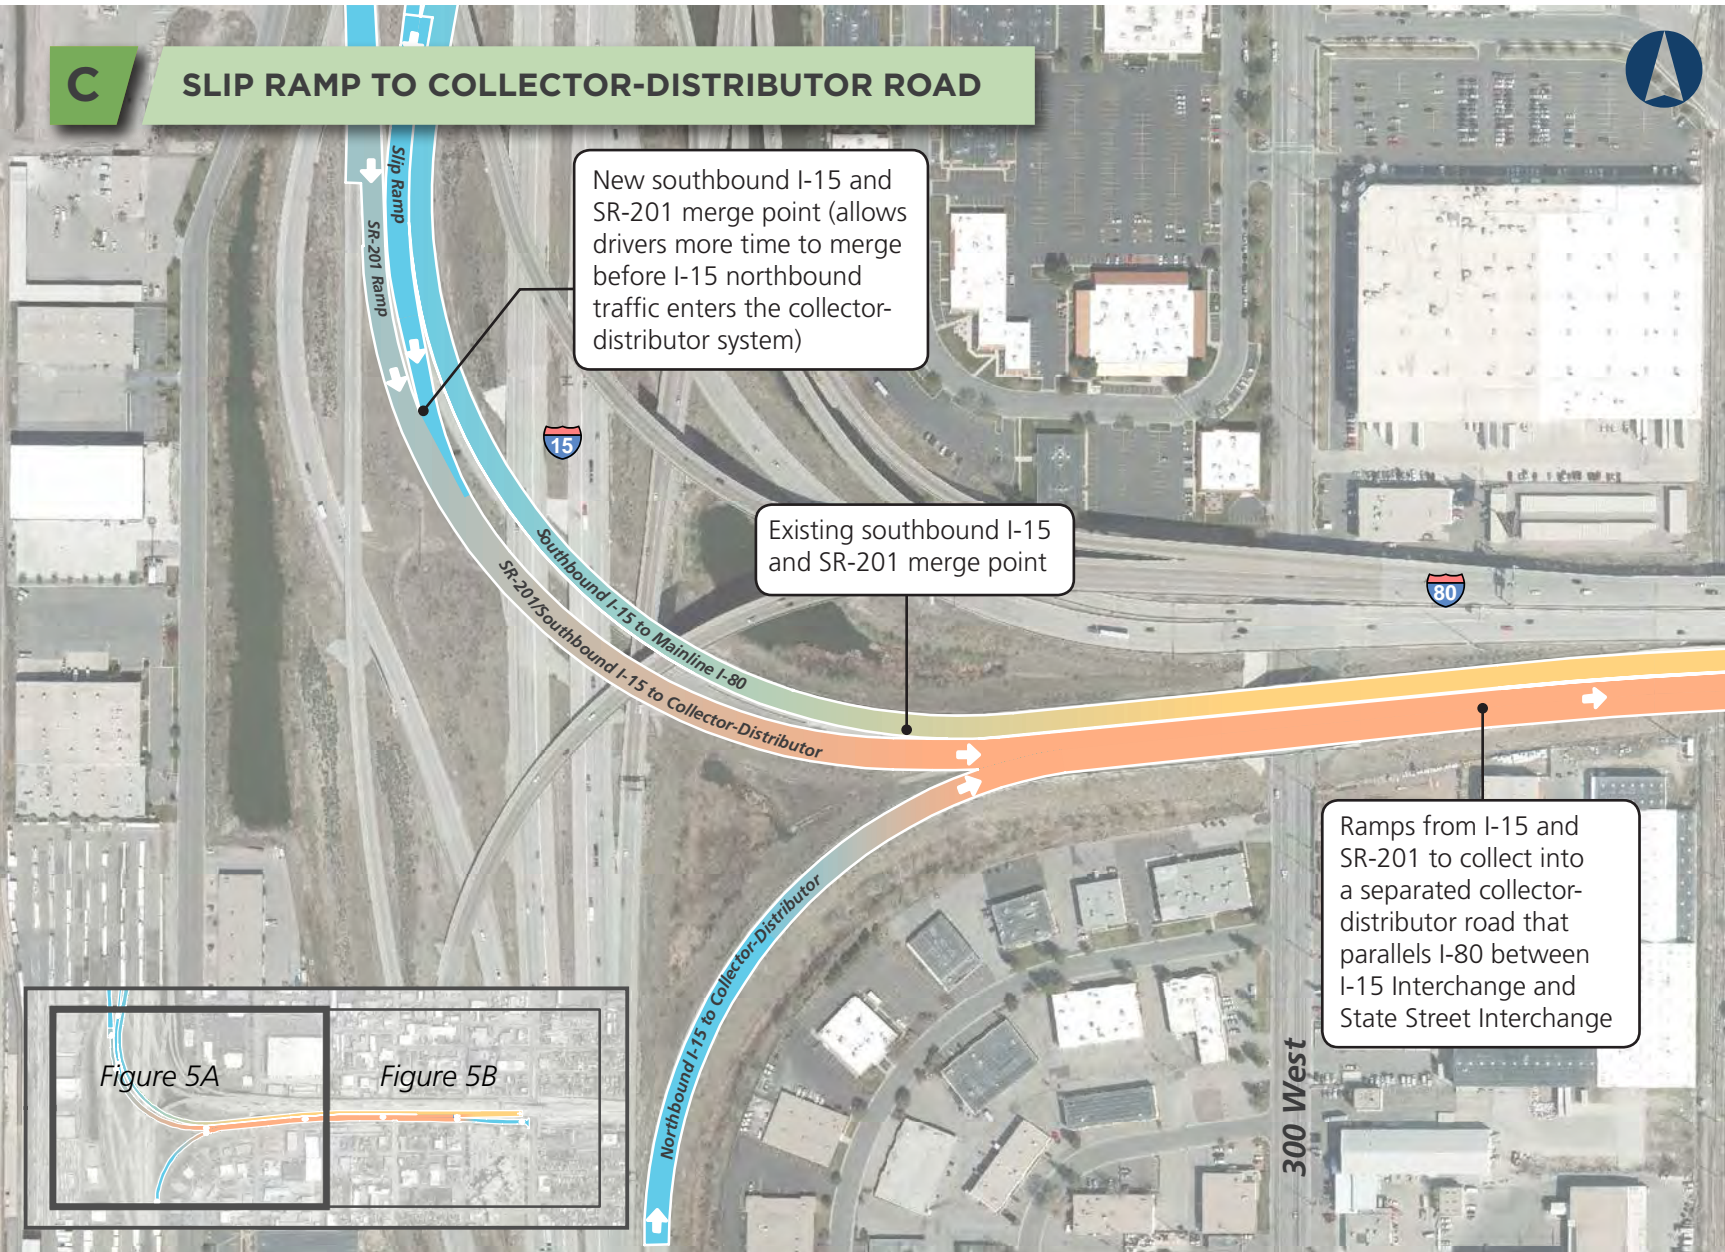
A Eastbound Weave Alternative C – Slip Ramp to Collector-Distributor Road
